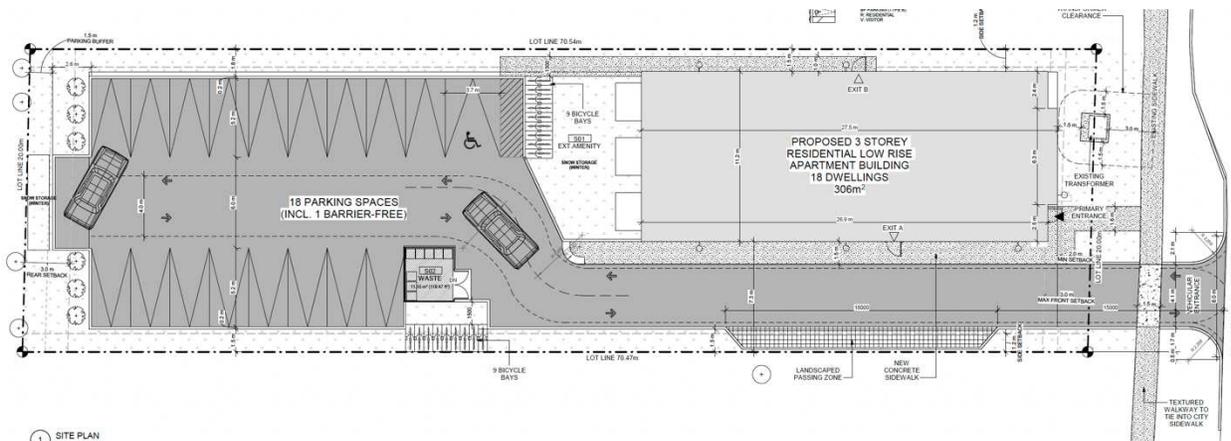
Extract of Site Plan (Source: Rossman Architecture).
